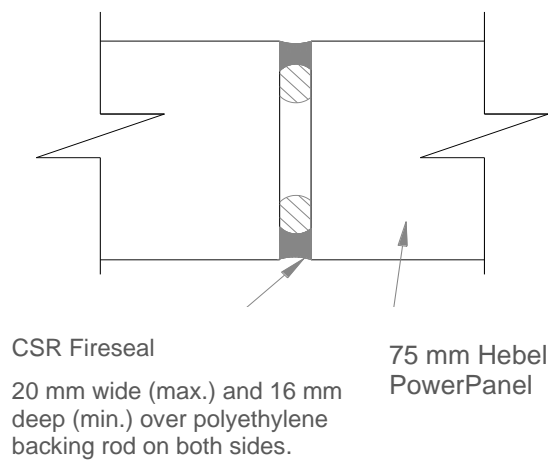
Vertical joint type 1 (-/60/60 and -/90/90 FRL) – 75 mm Hebel AAC panels
